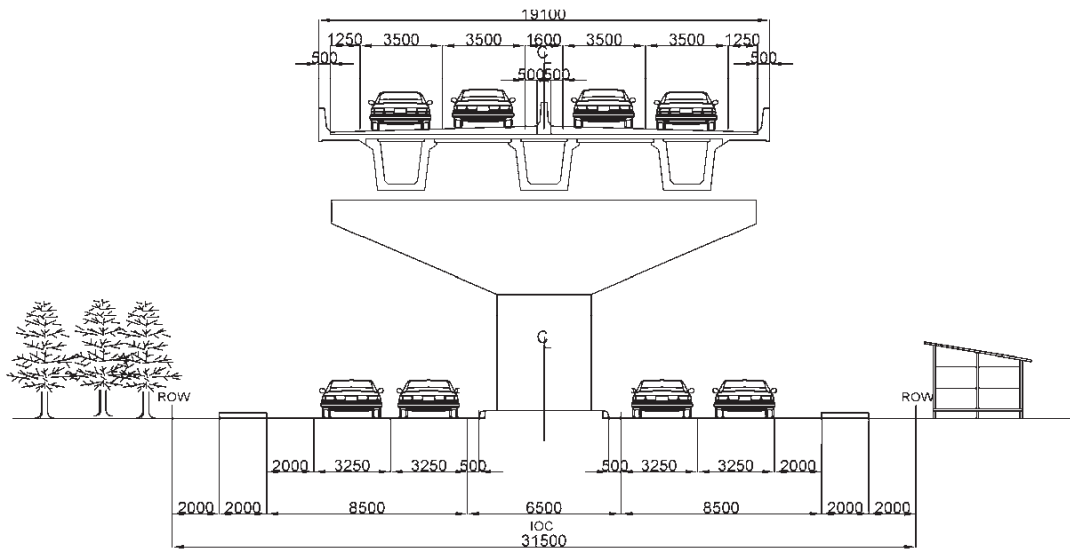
Typical Cross Section of New Bago-Kyaito Road
